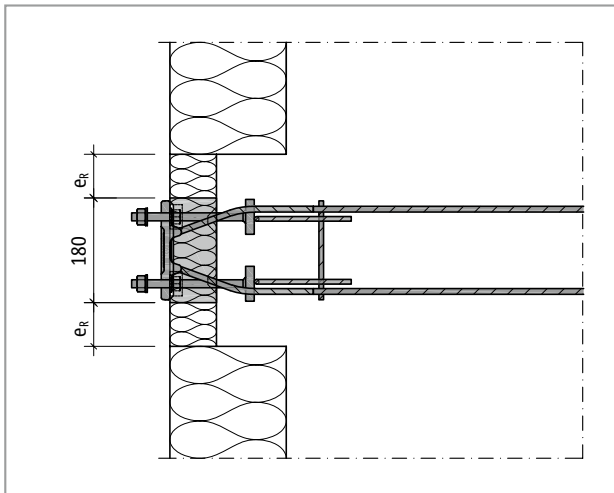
Schöck Isokorb® T type SQ: Edge distances
